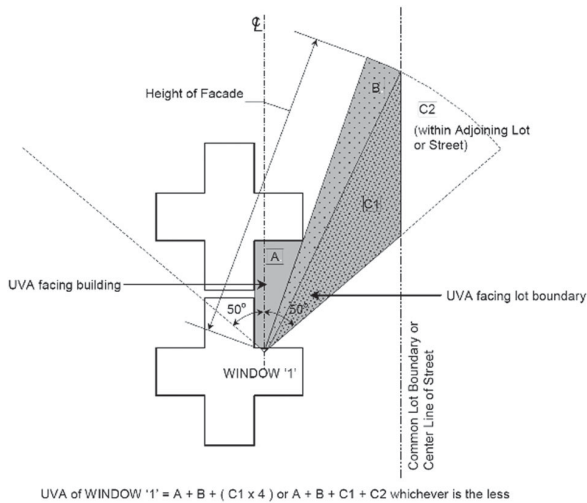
Measurement of UVA with the cone protruding beyond the site boundary. Source: Buildings Department (2005).
